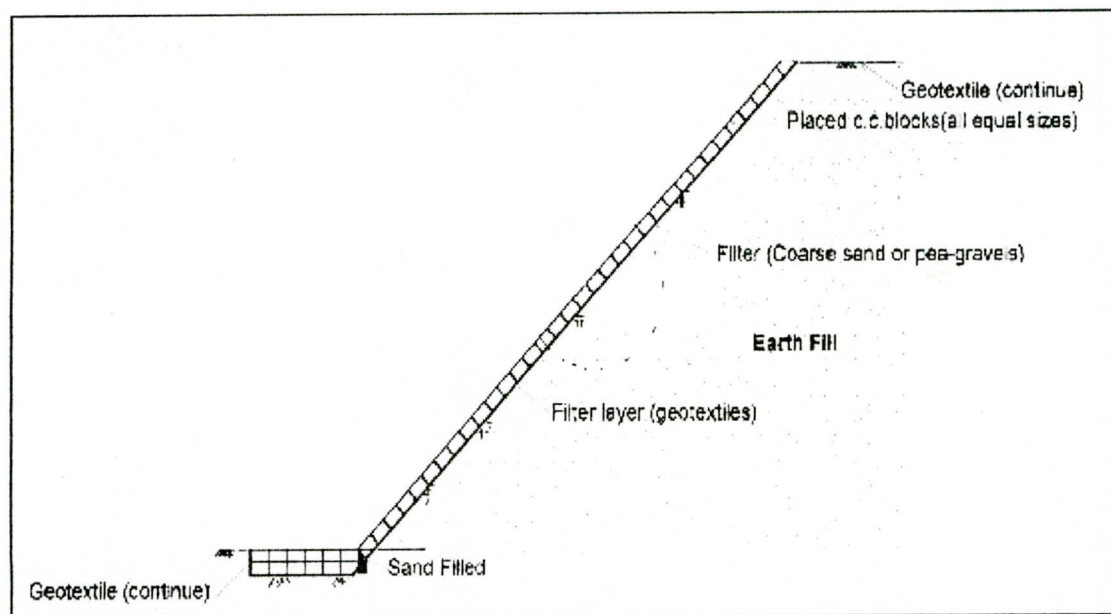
Double layers of blocks at toe of the structure to protect against sliding of blocks
